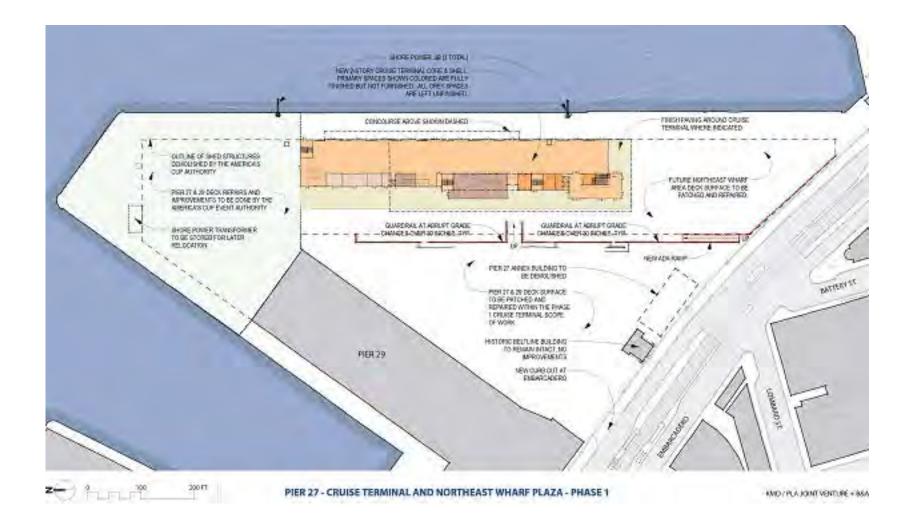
Proposed Pier 27 Cruise Terminal and Northeast Wharf Plaza - Phase I Source: KMD/PLA Joint Venture + B&A, February 2011
